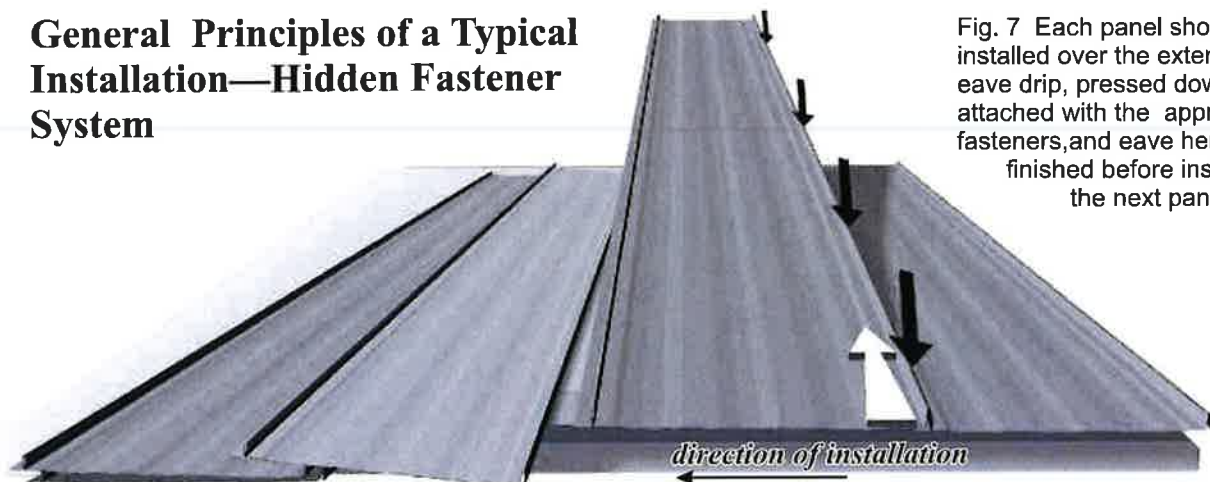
Each panel should be installed over the extended eave drip, pressed down and attached with the appropriate fasteners, and eave hems finished before installing the next panel.
